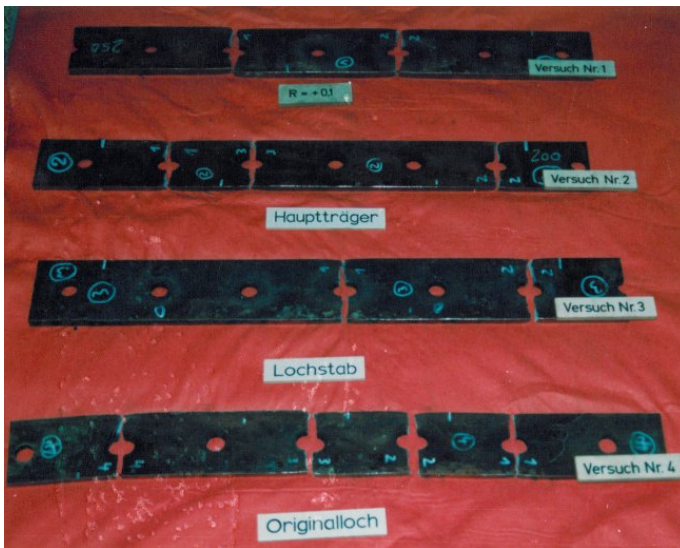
Stahringer bridge main girders - Cracks from the main girders after fatigue failure. The cracks initiated at different locations.
